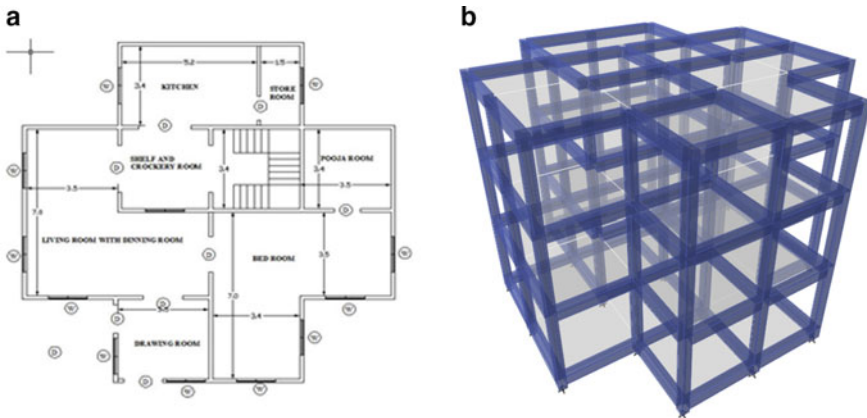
a Sectional plan of the building b 3D model of the building in ETABS
